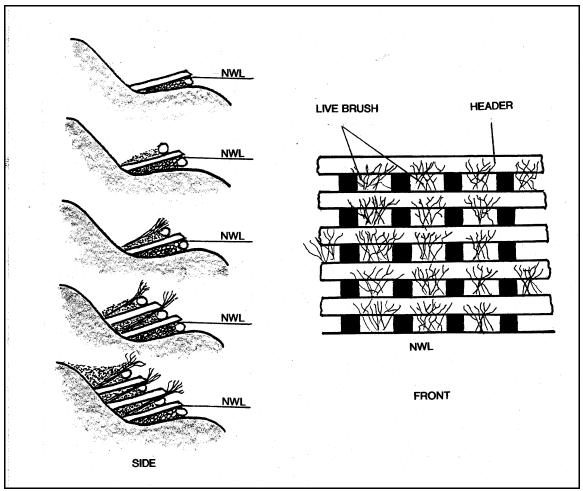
Construction of a live cribwall (Source: CBBEL Files)
